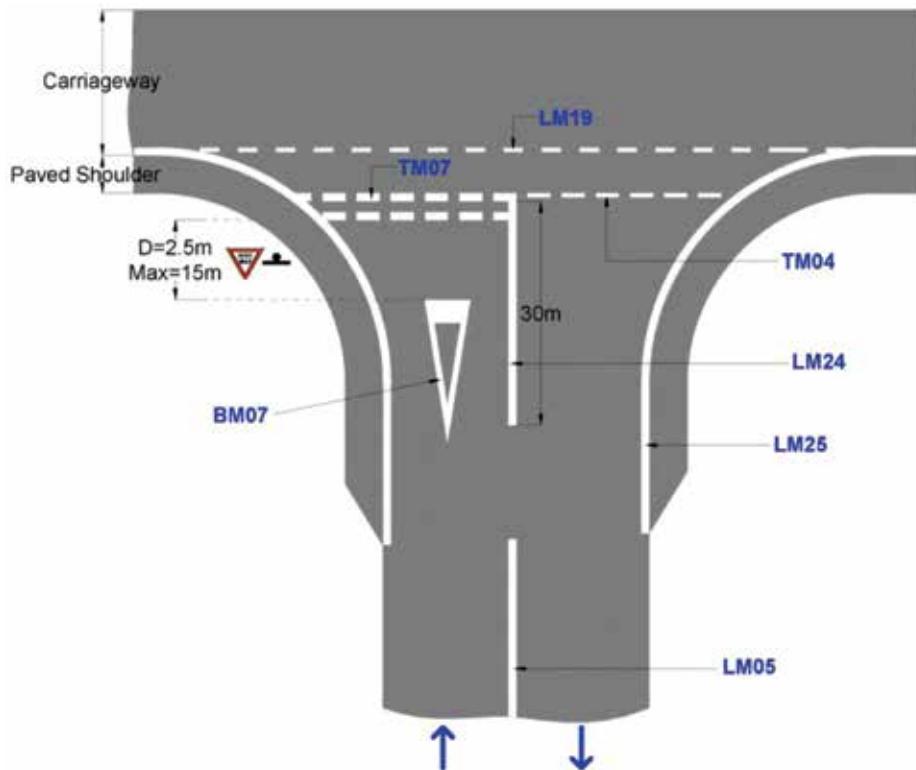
Give Way Marking (Major Road with Paved Shoulder)
